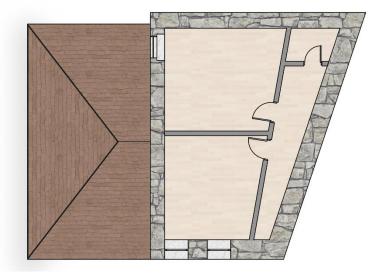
Beqiri, A. (2024) Lluke Zanati House First Floor plan
